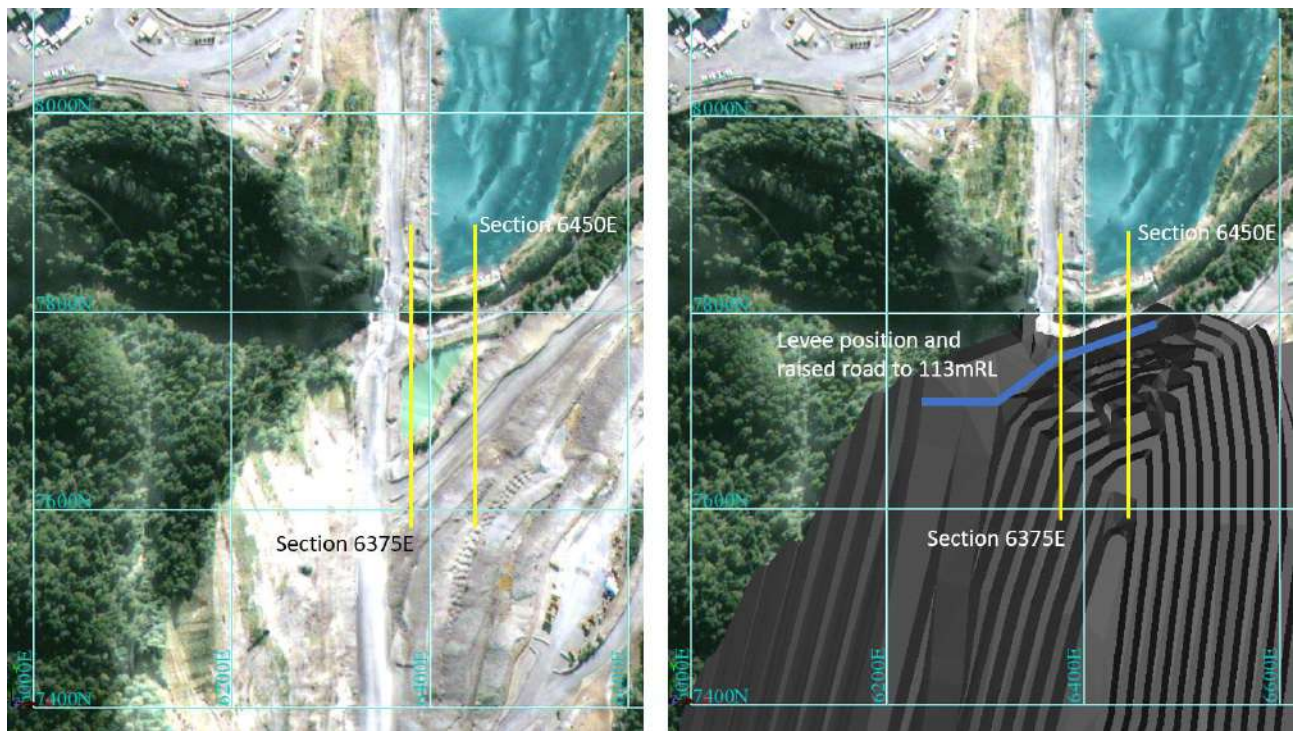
Aerial photo showing levee location on the pit design and Section locations
